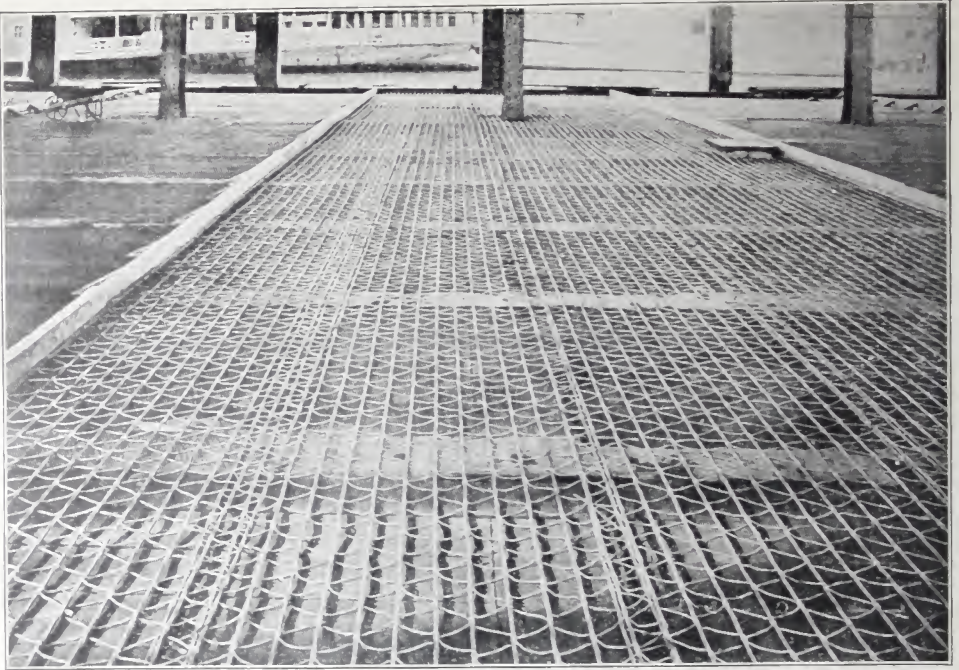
Absolute minimum cost of installation resulted from the use of Triangle Mesh Reinforcement in Pier 42, North River, New York City. Notice how this heavy 3-strand fabric stays in correct position.
